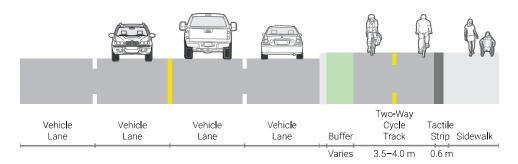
Cross-Section of Two-Way Cycle Track
